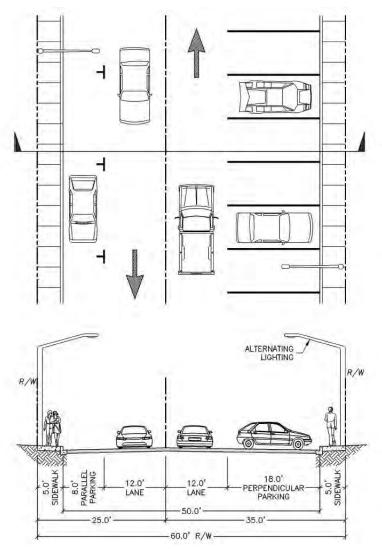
Potential 10th Street 60' Plan/Cross-Section
